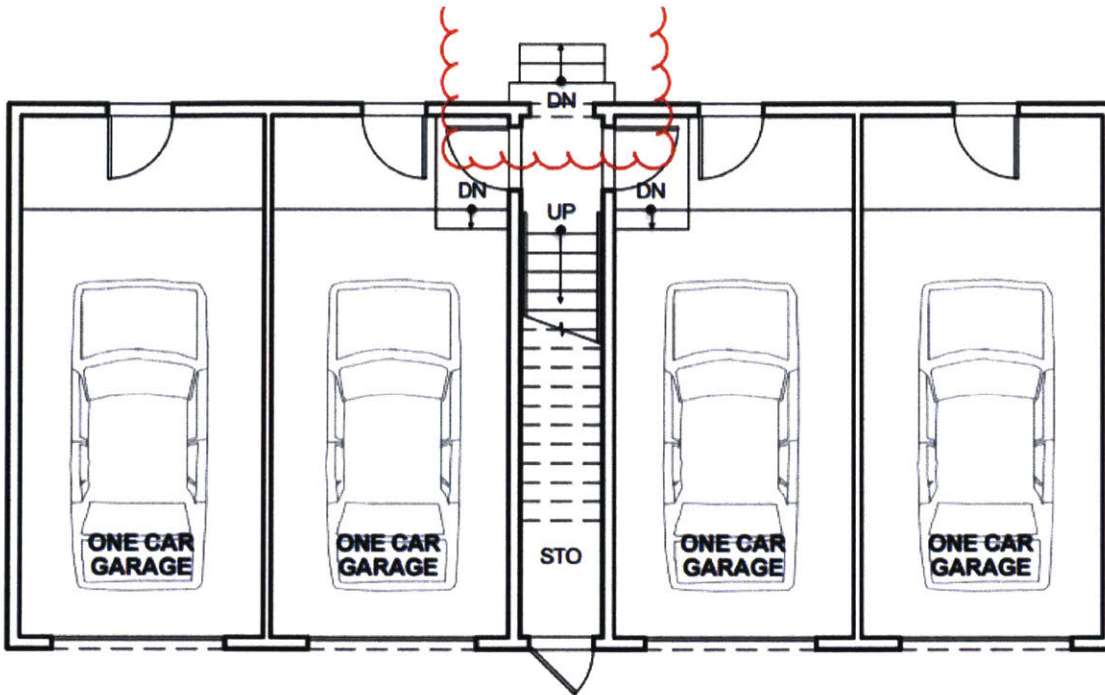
Garage Detail for the 14 and 18 Unit Plans (1 Bedroom Units Located Above)⁴⁸
